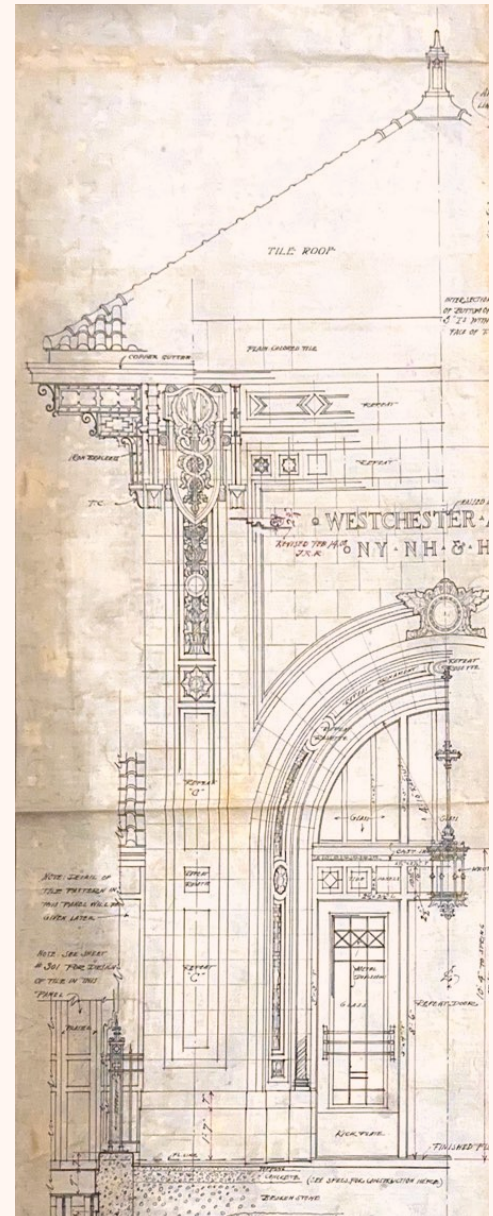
Drawing Research and Site Photos from the Cass Gilbert's Westchester Avenue Station Pre-Schematic Conditions Assessment
